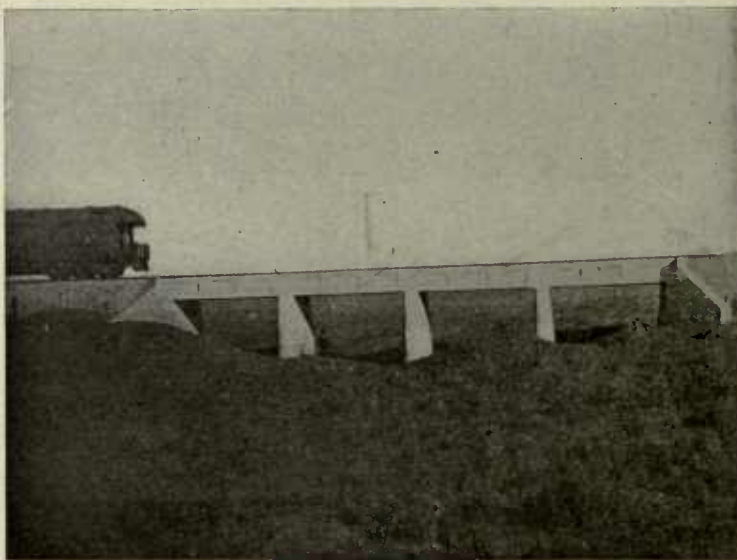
CONCRETE TRESTLE ON PIERS OVER 16 FT. HIGH.
